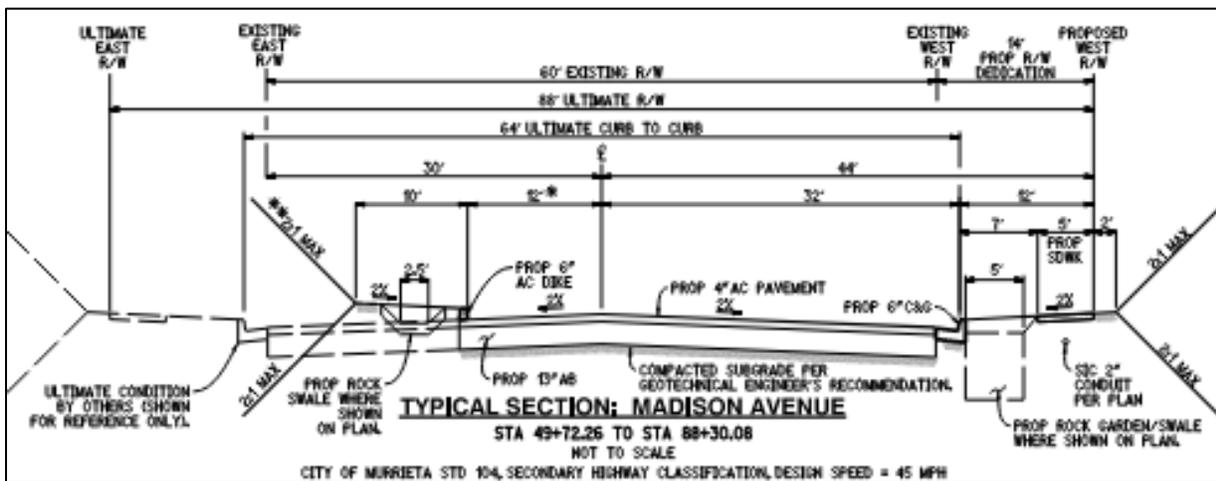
Typical Cross-Section with Rock Garden/Swale
